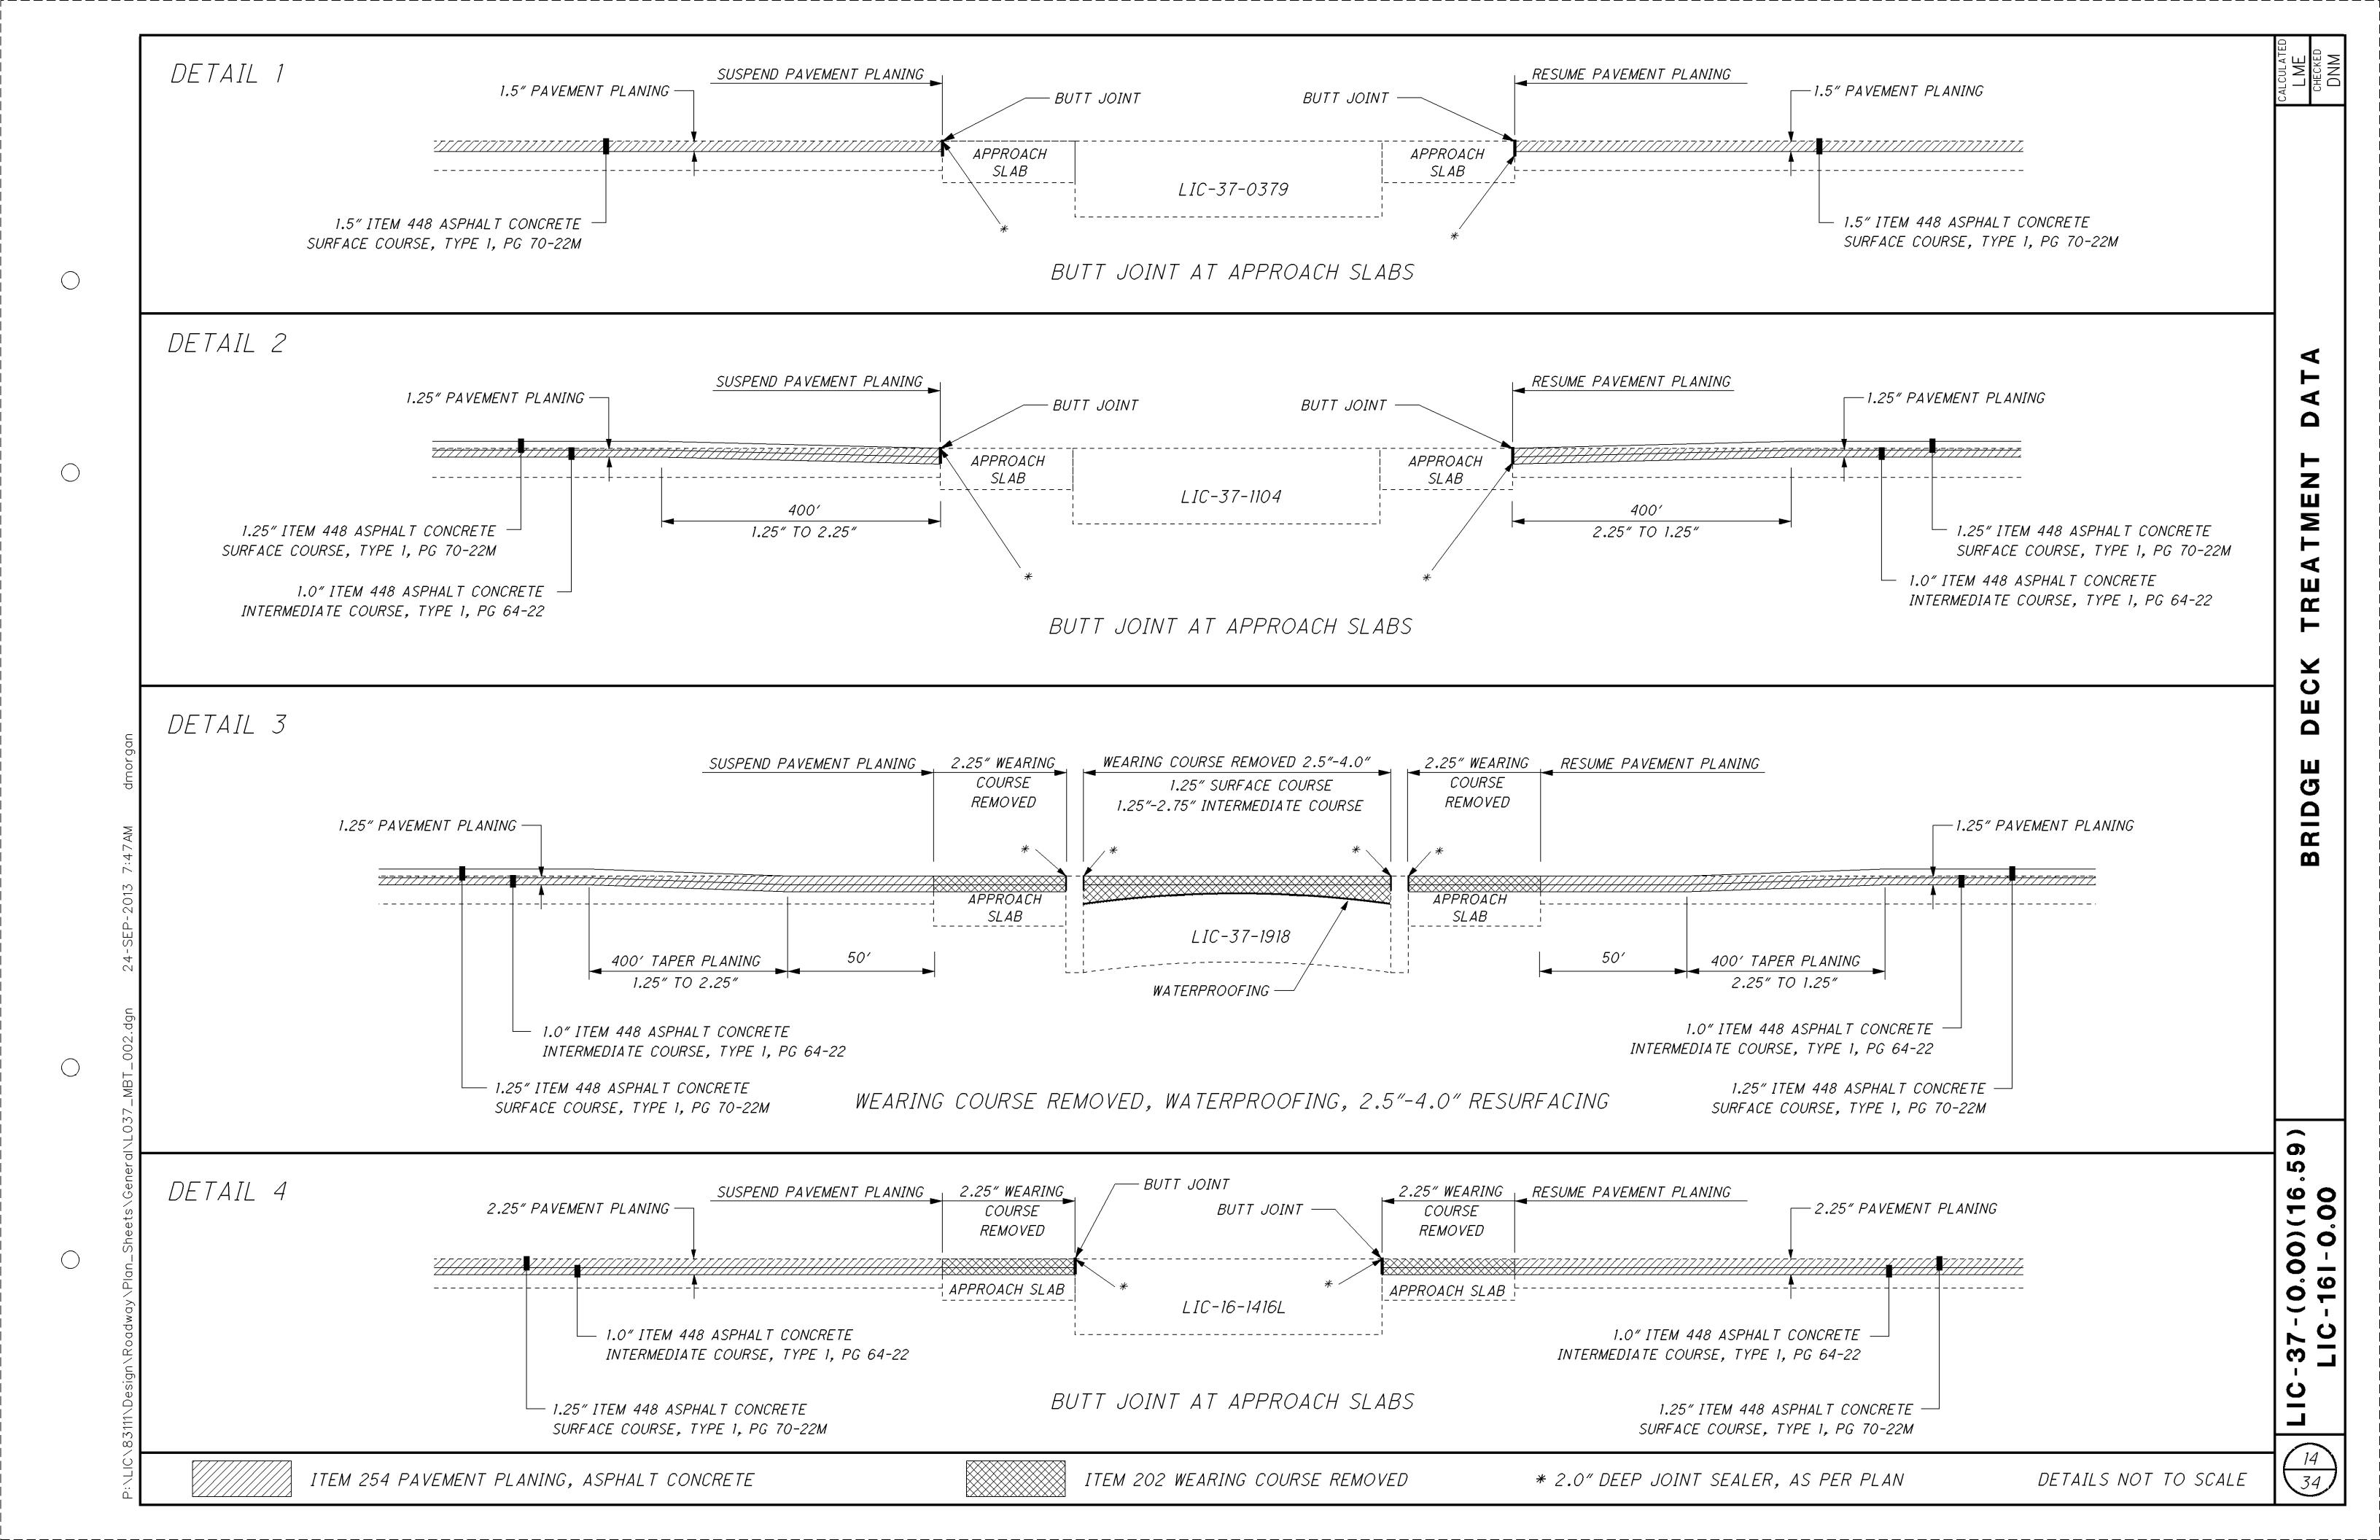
LIC-37-1918: REMOVE ASPHALT, WATERPROOF, PLACE 2.5"-4" ASPHALT CONCRETE
